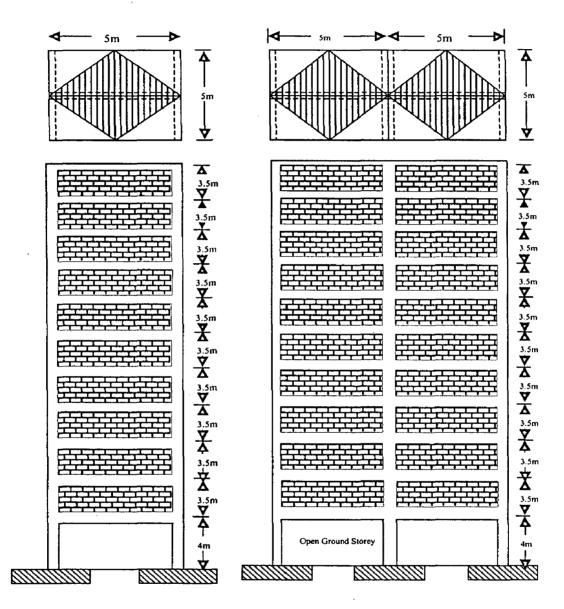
Plan and elevation of G+10 storeyed plane frame building's one-bay and two-bay frames with soft storey
